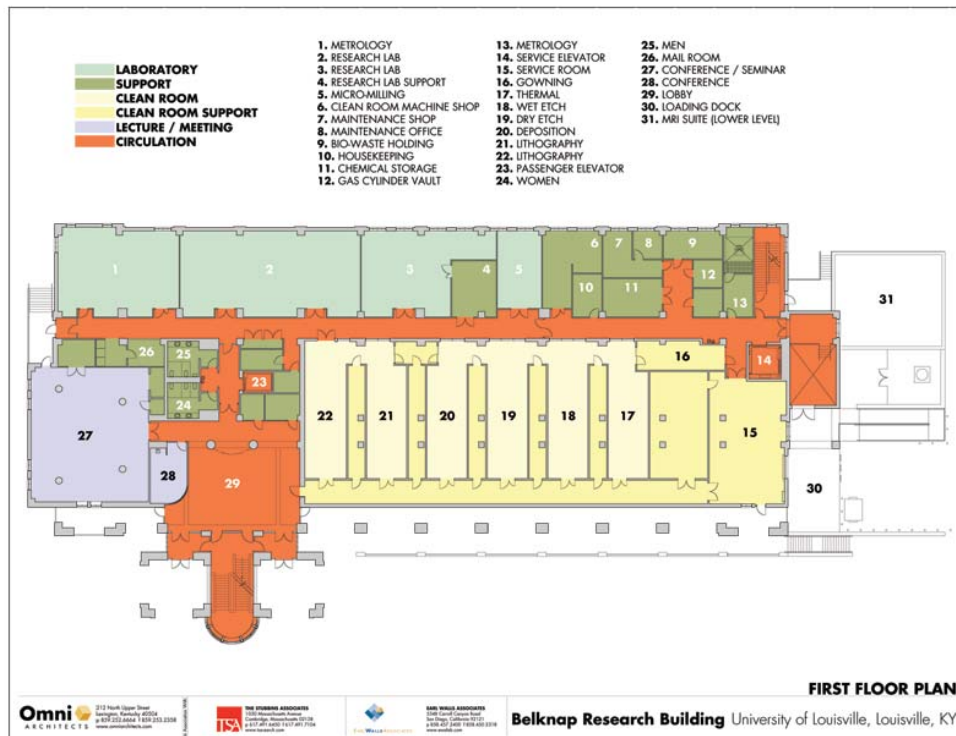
First floor layout showing the \$8.5M 8,000 sq. ft. cleanroom core facility.
